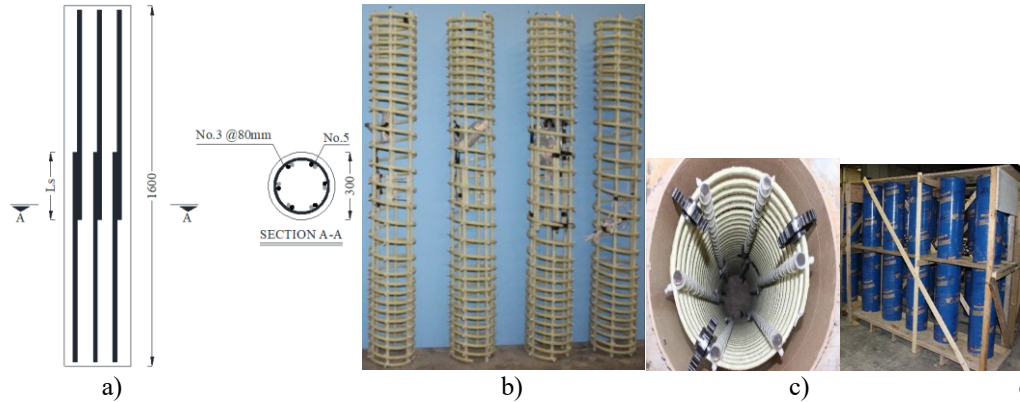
a) Geometric and reinforcement details of the test specimens, (b) assembled cages, (c) GFRP cages inside the formwork, and (d) wooden formwork and Sonotubes.
